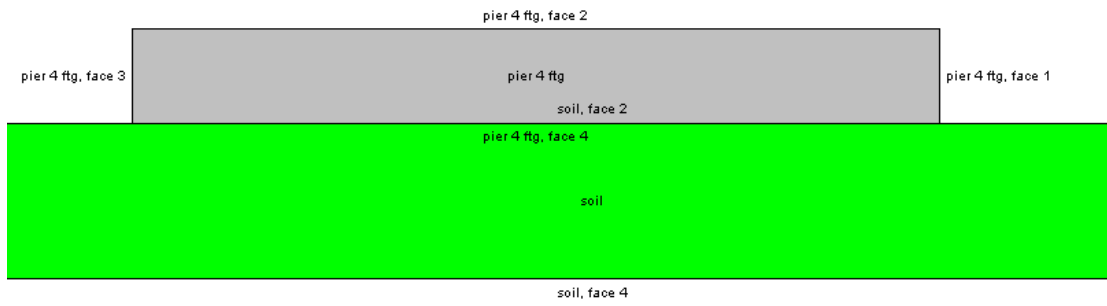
US34 pier 4 footing layout without cooling pipes (not in scale)
